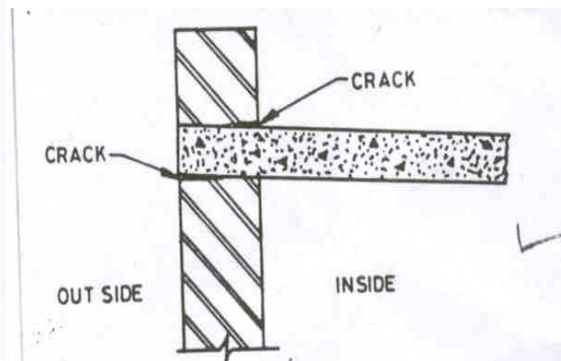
Horizontal Cracks in a Wall at Supports Due to Excessive Deflection of a Slab of Large Span
